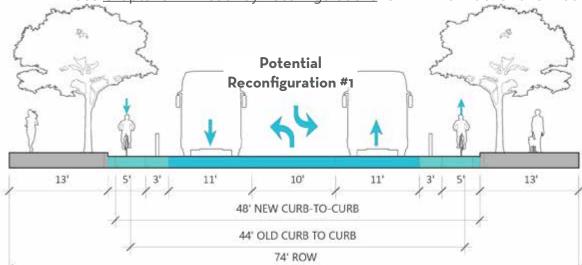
Potential Reconfiguration #1: One-Way, In-Street, Class IV Bikeway on a Downtown Collector Street.
